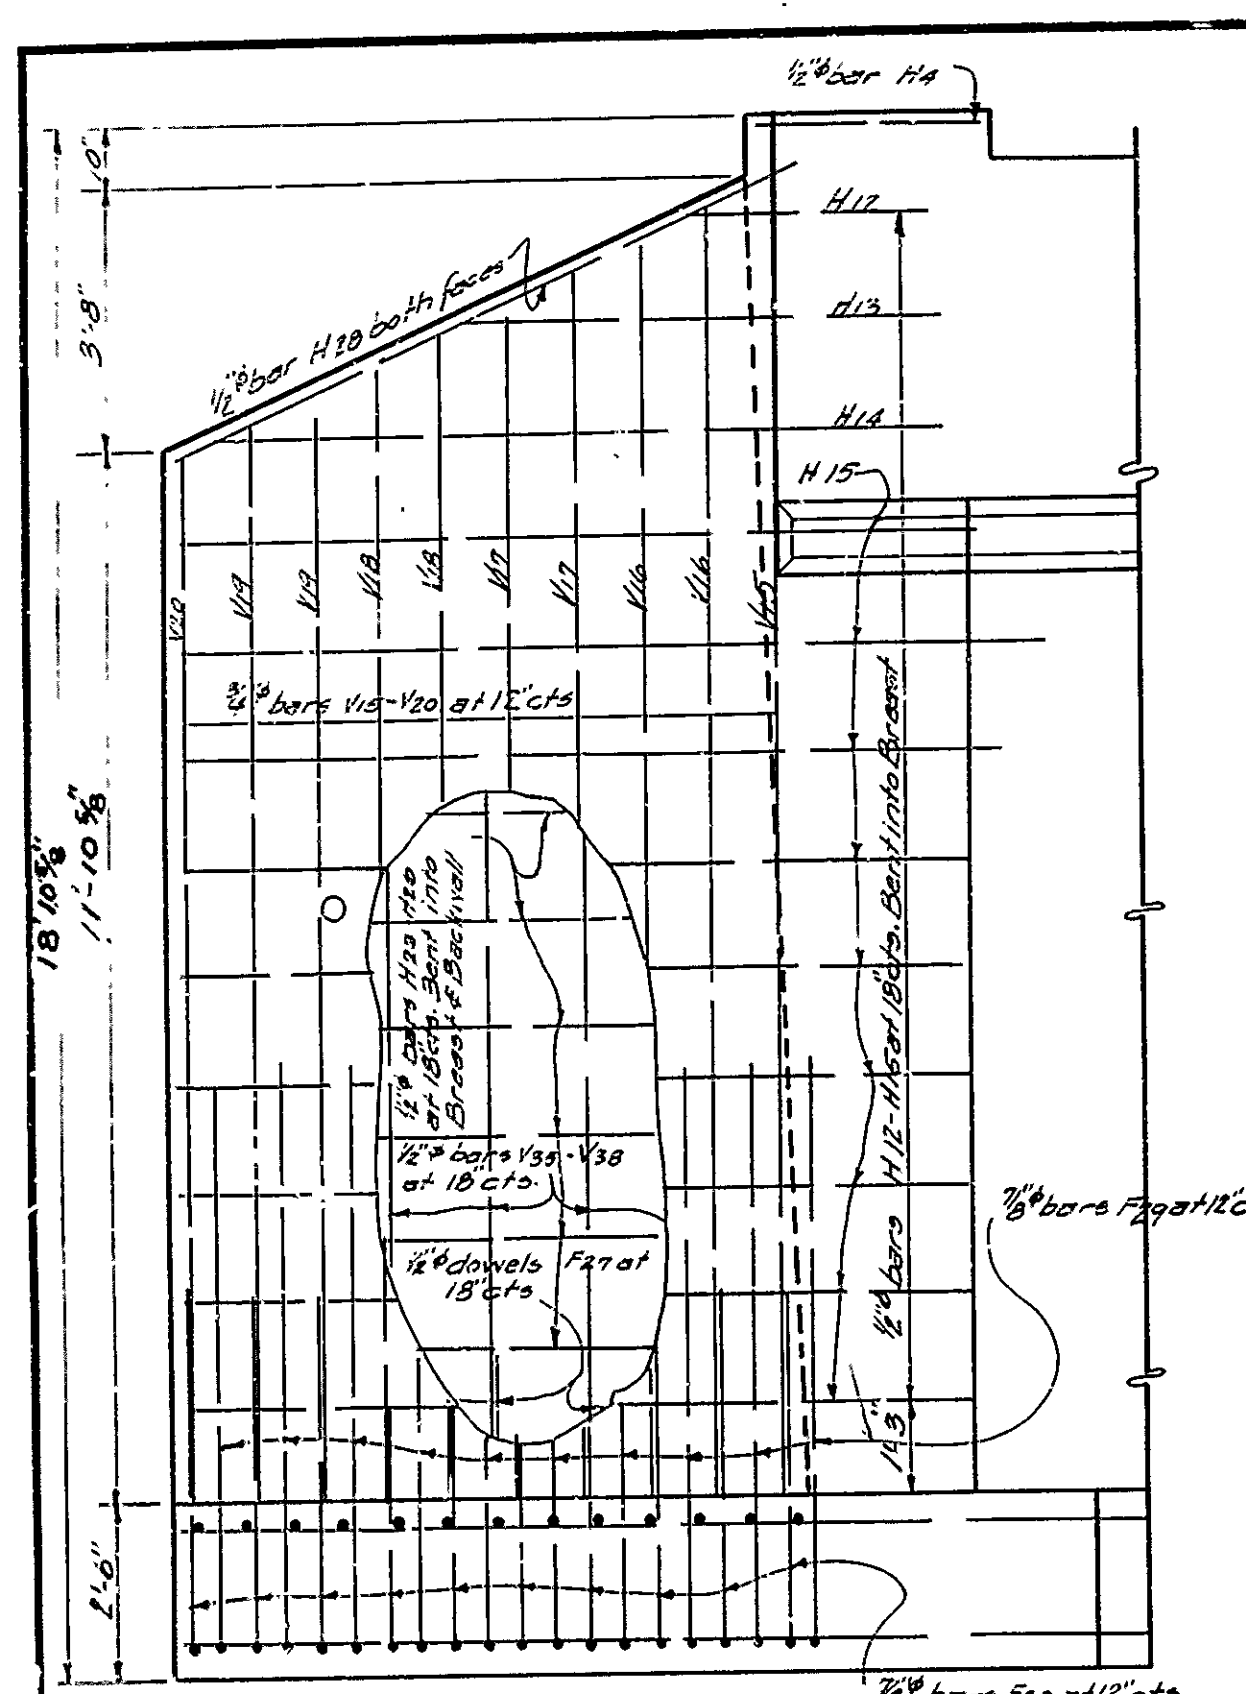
DETAILS OF FOOTING-ABUT. NO. 1 AND PIERS
